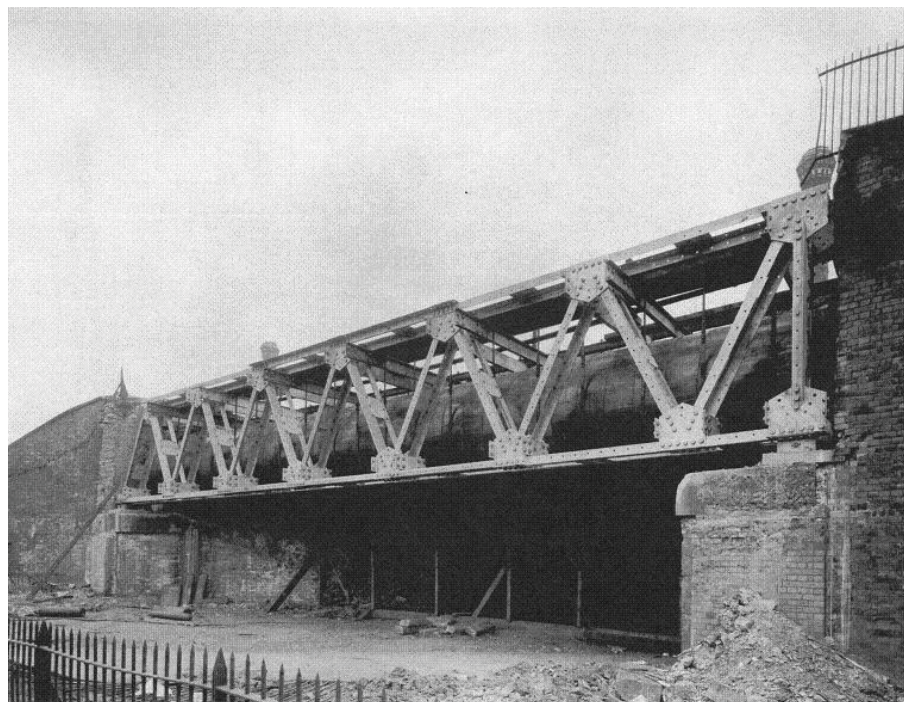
View of Abbey Lane Pedestrian Bridge reconstruction, 1941
